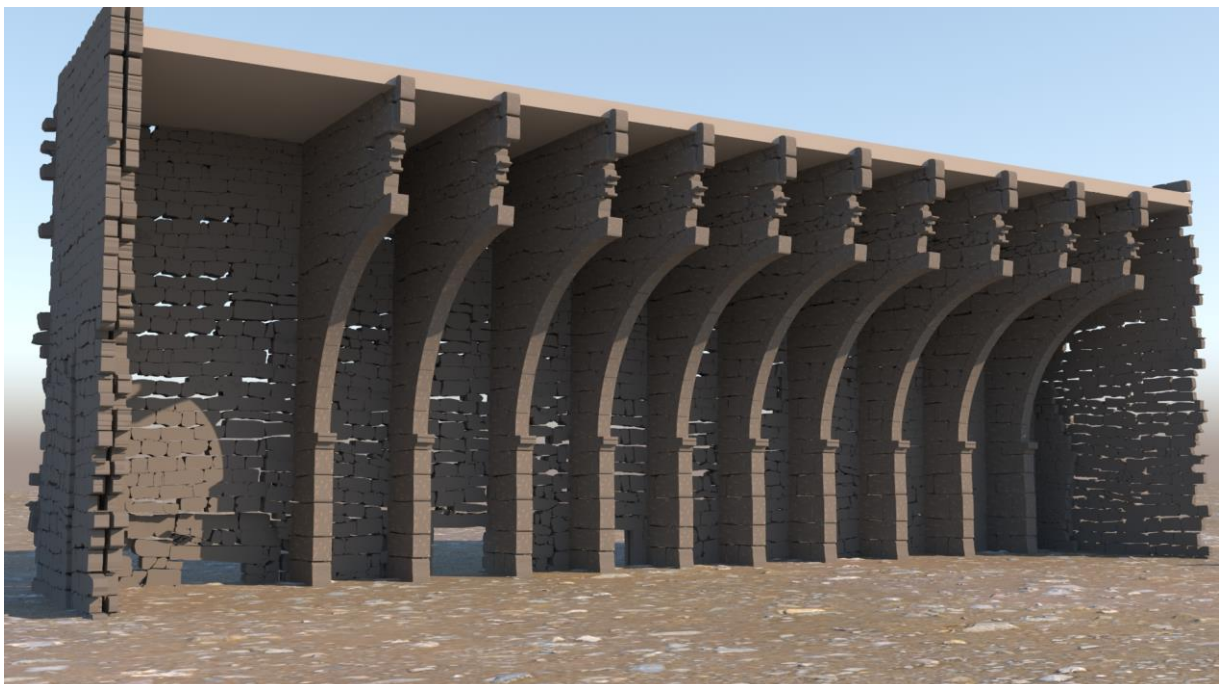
3D section showing the roof and arches inside the Julianos church. Author
